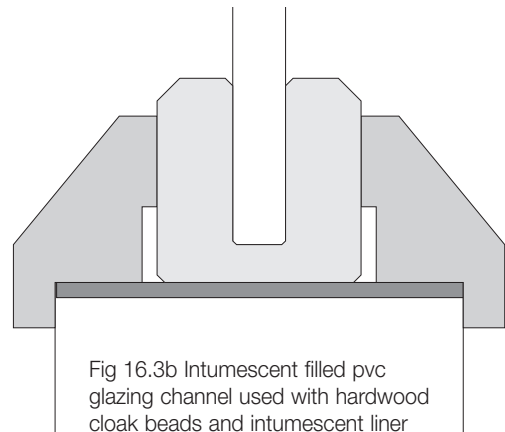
Intumescent filled pvc glazing channel used with hardwood cloak beads and intumescent liner
